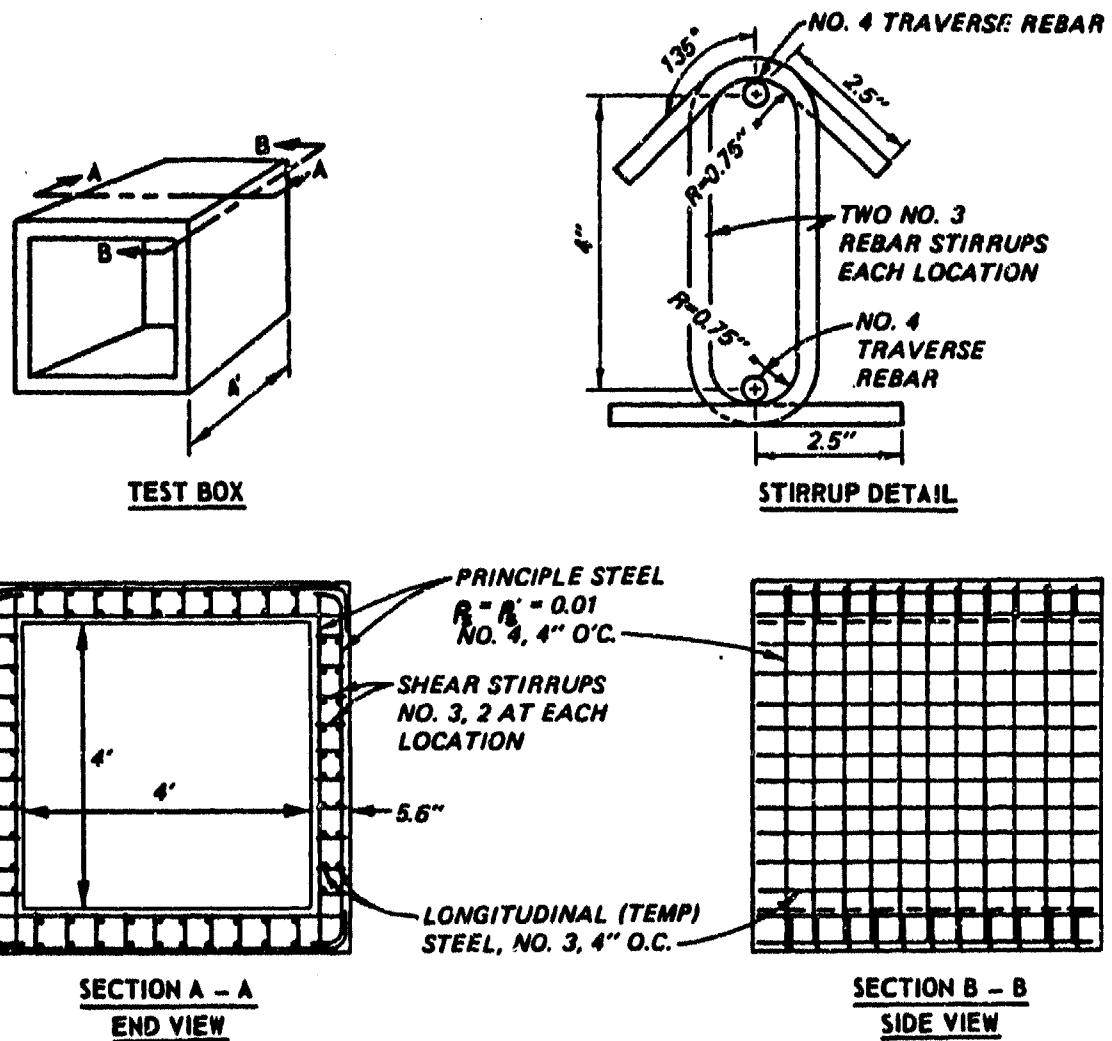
Test Element Construction Details, Test Group I (Kiger'82)
